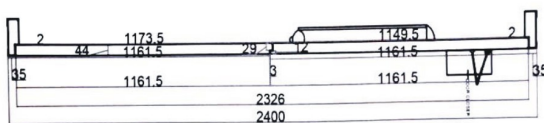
Top view showing fixing details of frame and leaf of steel double door set
